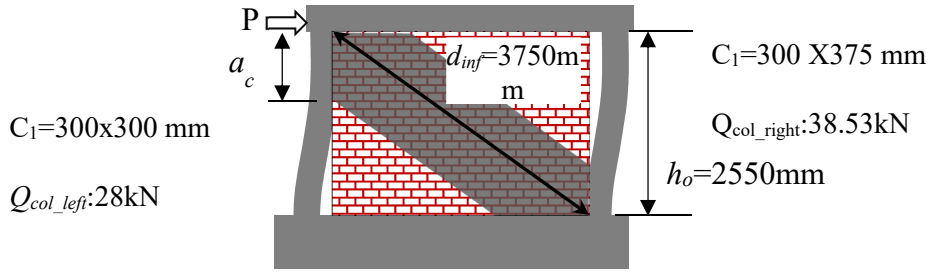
Masonry Infilled RC Frame  $W_1$
